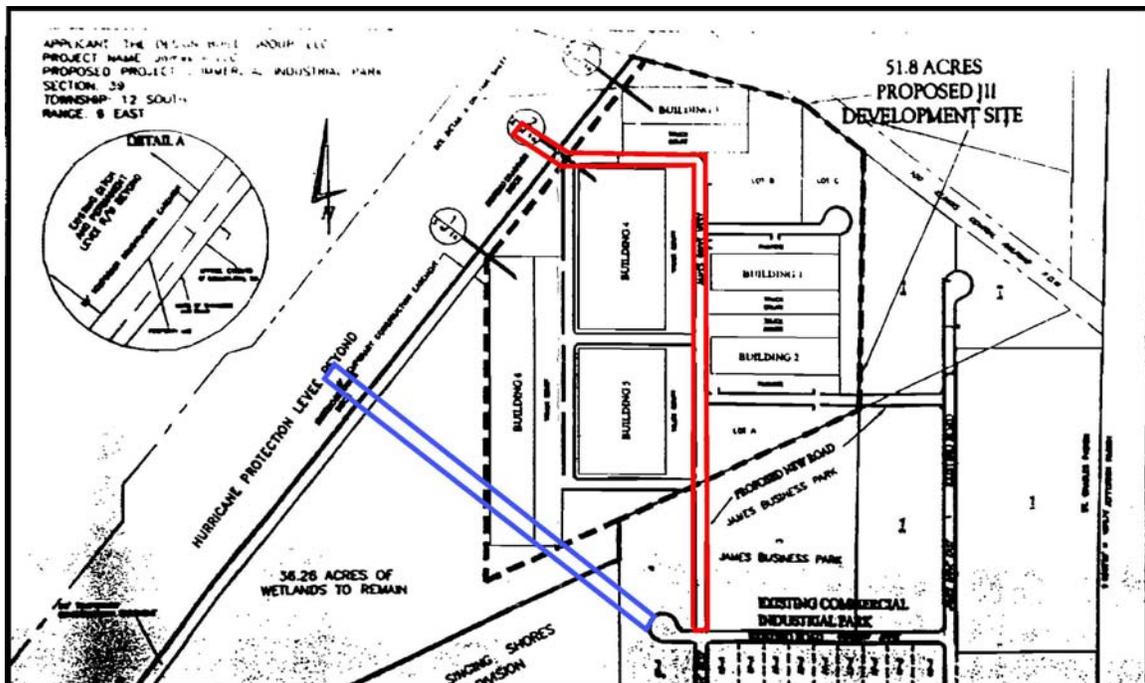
The proposed (in red) and previously approved (in blue) Walker Access Road in relation to permitted plans of future industrial park development.
